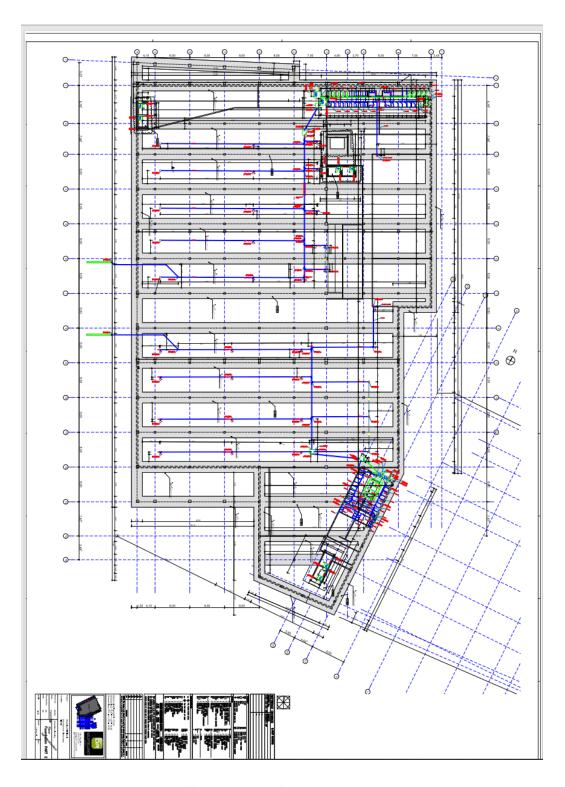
AIP Foundation (Part 1, Sheet 1)
